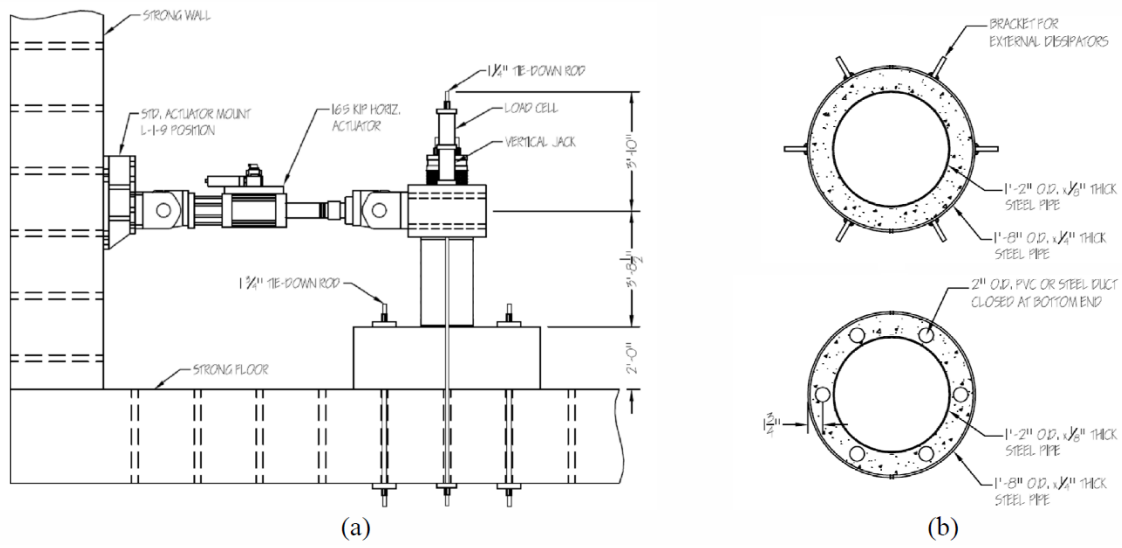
Specimen drawings: (a) Test Setup; (b) Column base cross sections for Unit 1A (top) and Unit 1B (bottom)
